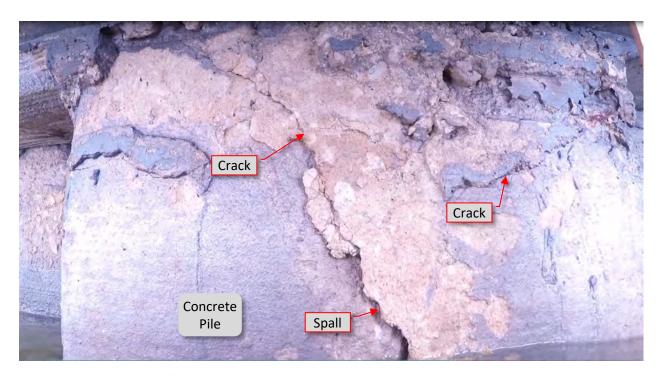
P16. STA 3+56. Spall/crack on south side at pile.
